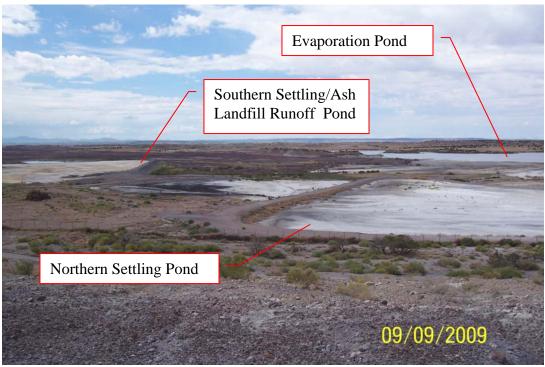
View from Ash Landfill area towards settling ponds and Evaporation Pond.
